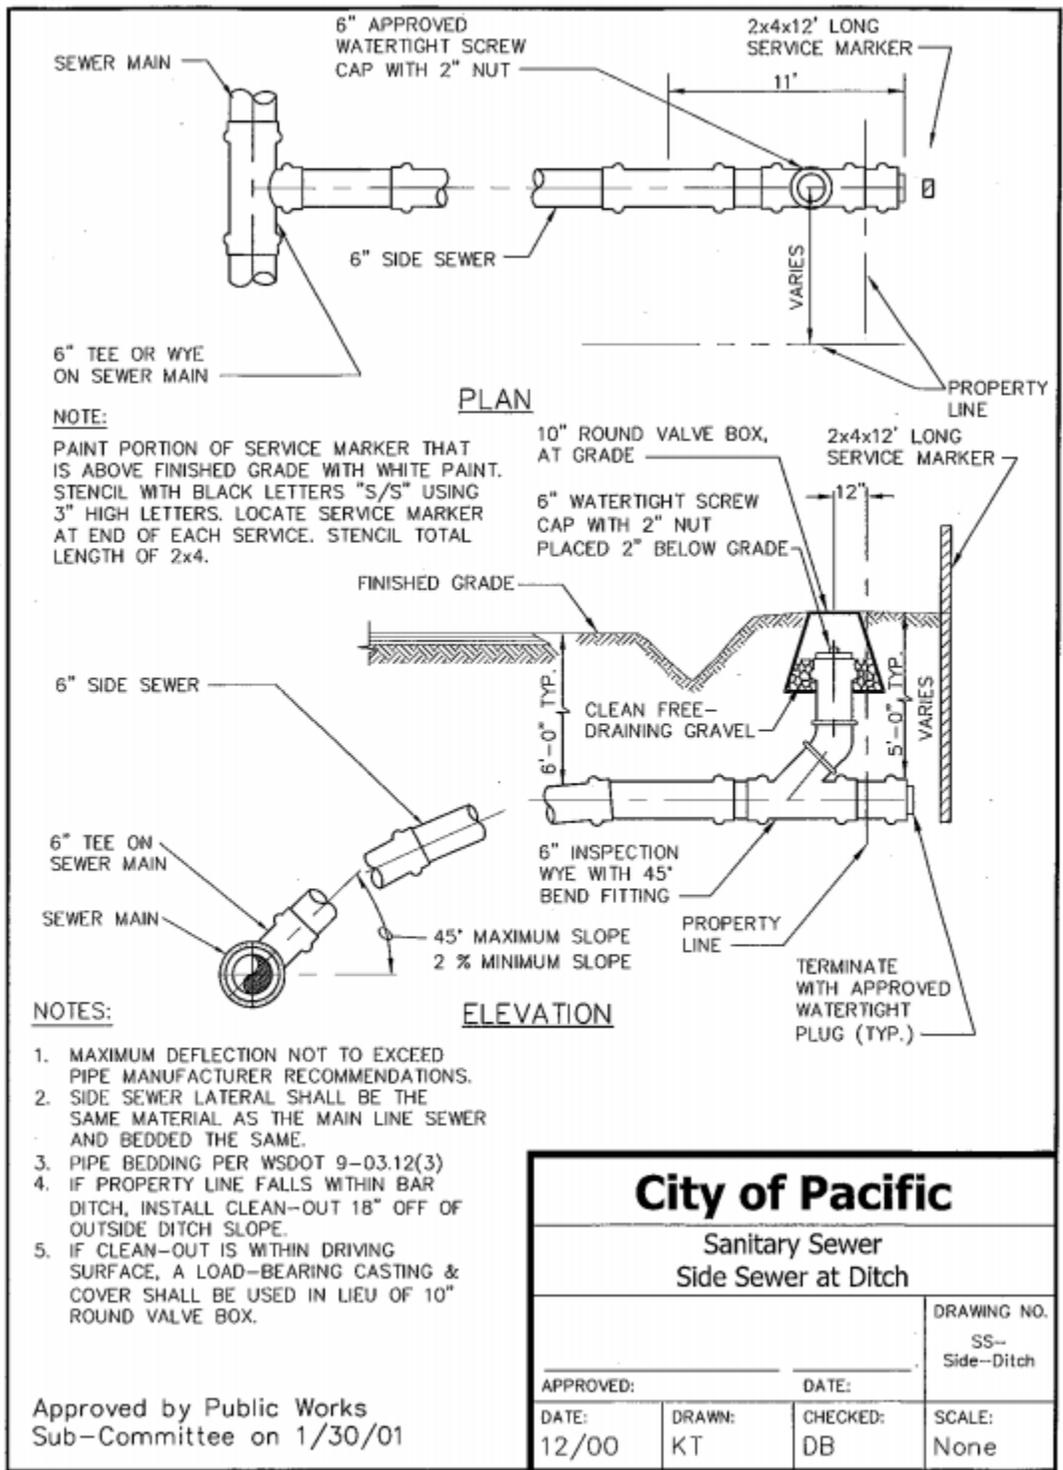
Example: Side Sewer at Ditch Detail (BMP A.6)
